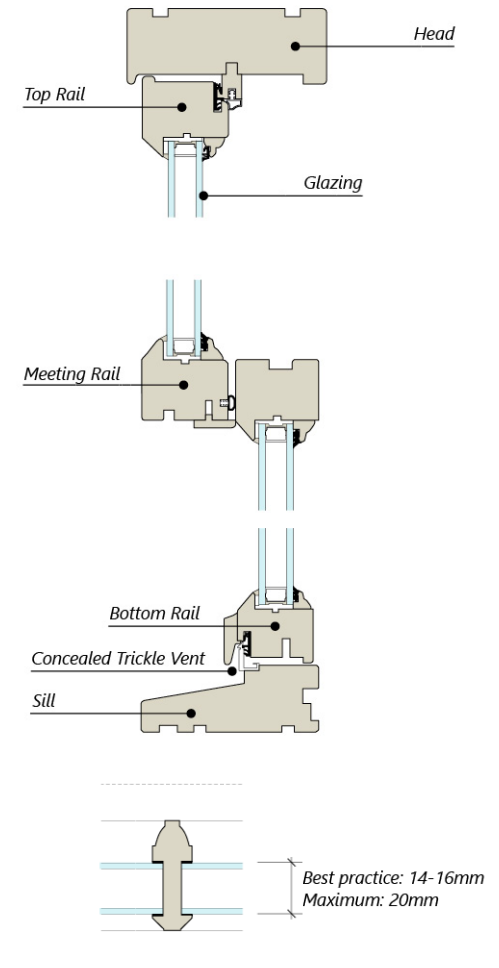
Double-glazed sash window. Astragal detail (bottom). Head-midrail-cill detail (above).
